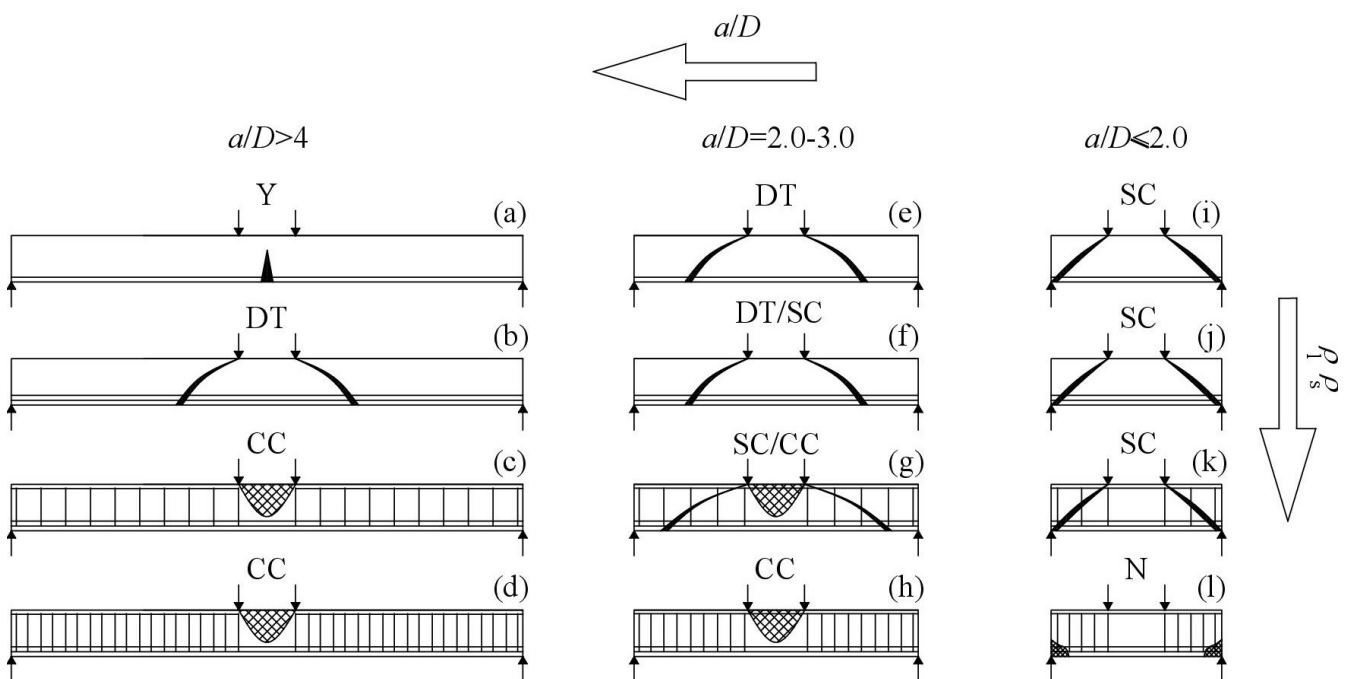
Sketches of failure modes of RC beams with/without stirrups of varying geometry and reinforcement ratio (Y - reinforcement yielding, DT - diagonal tension, SC - shear-compression, CC - concrete crushing and N –support zone crushing)
